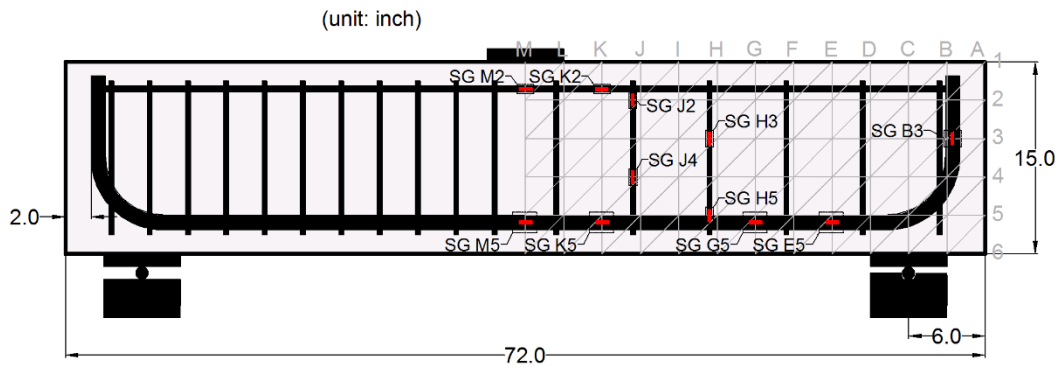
Typical location and orientation of steel strain gages on rebars in RCS beams (All phases)
